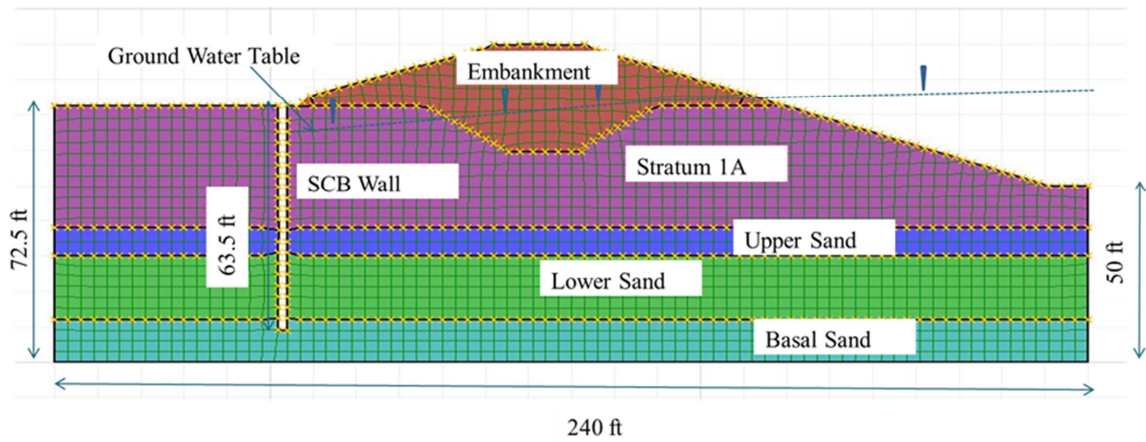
Cross section of the slurry trench wall of Lake Dam (Lake Tyler).
